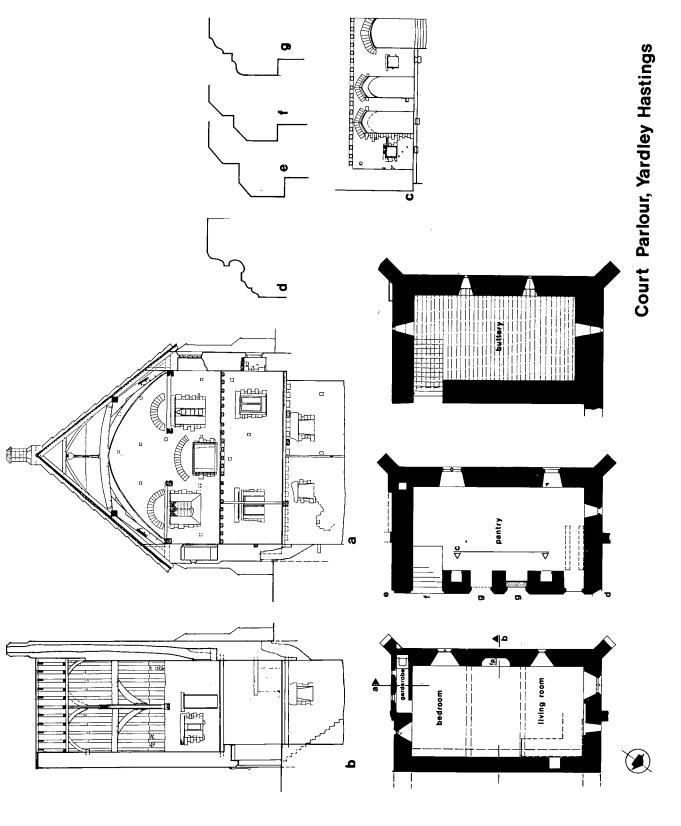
Yardley Hastings, the Court Parlour. Plans, details.
